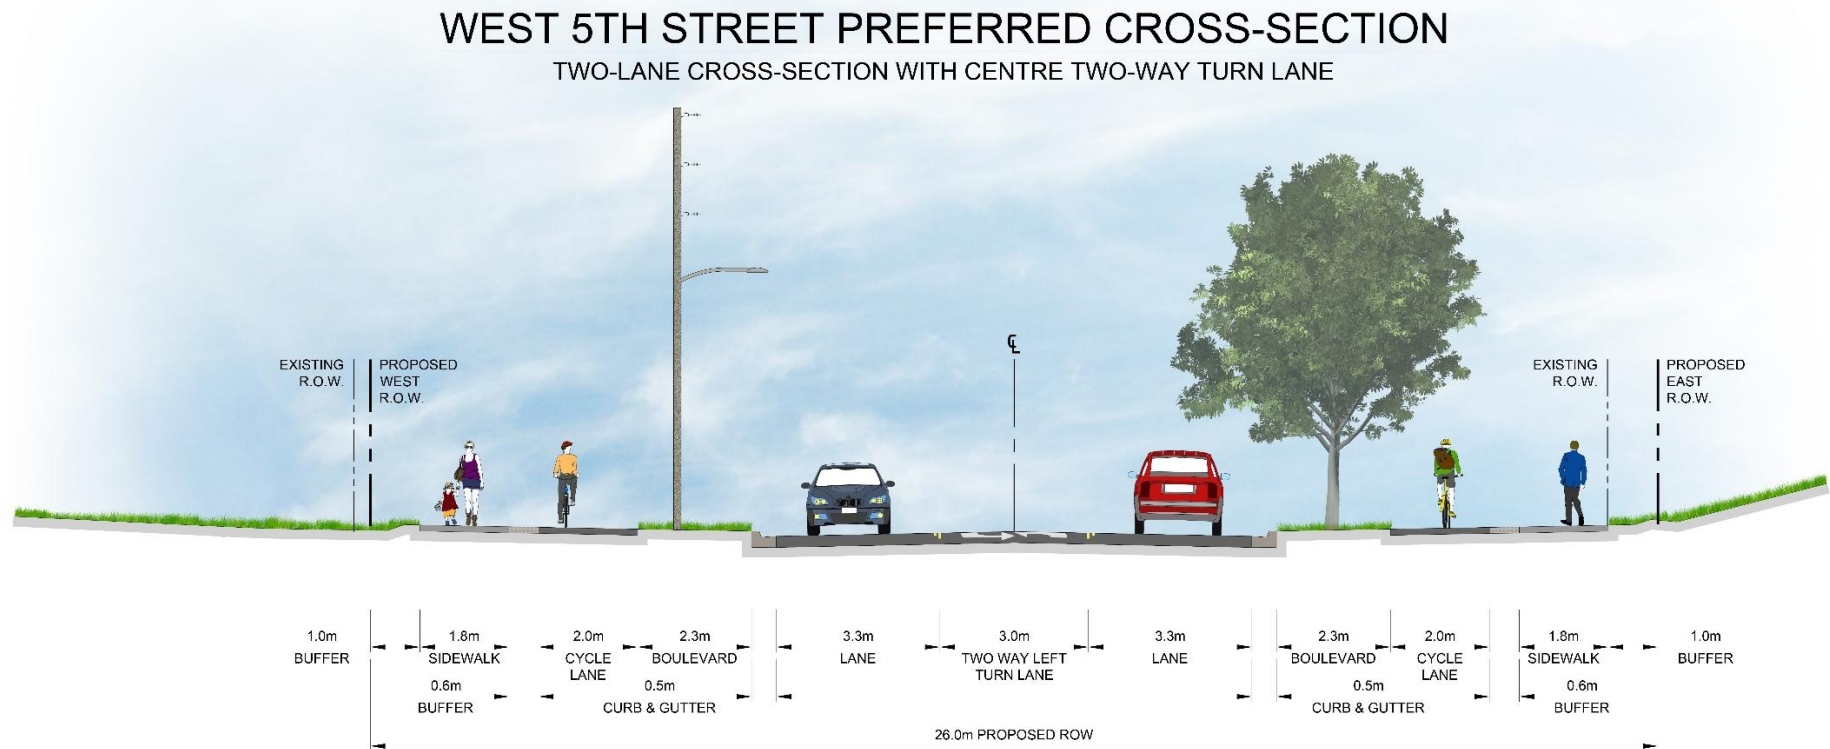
Recommended Plan Typical Cross-Section (Modified Alternative 2)
